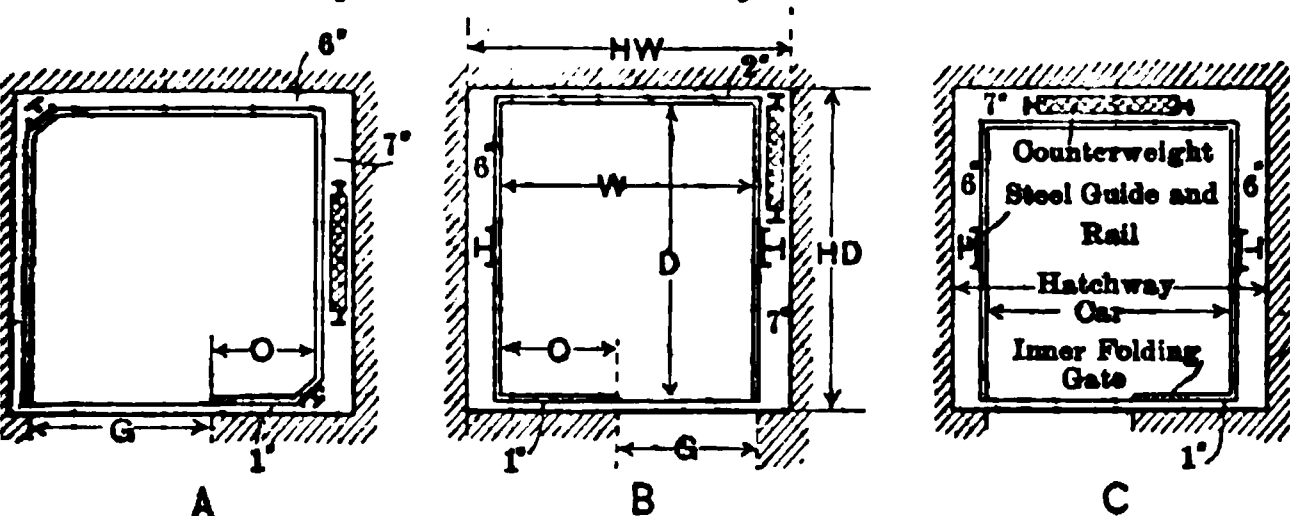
Typical Layouts for Elevator-hatchways and Car-platforms
